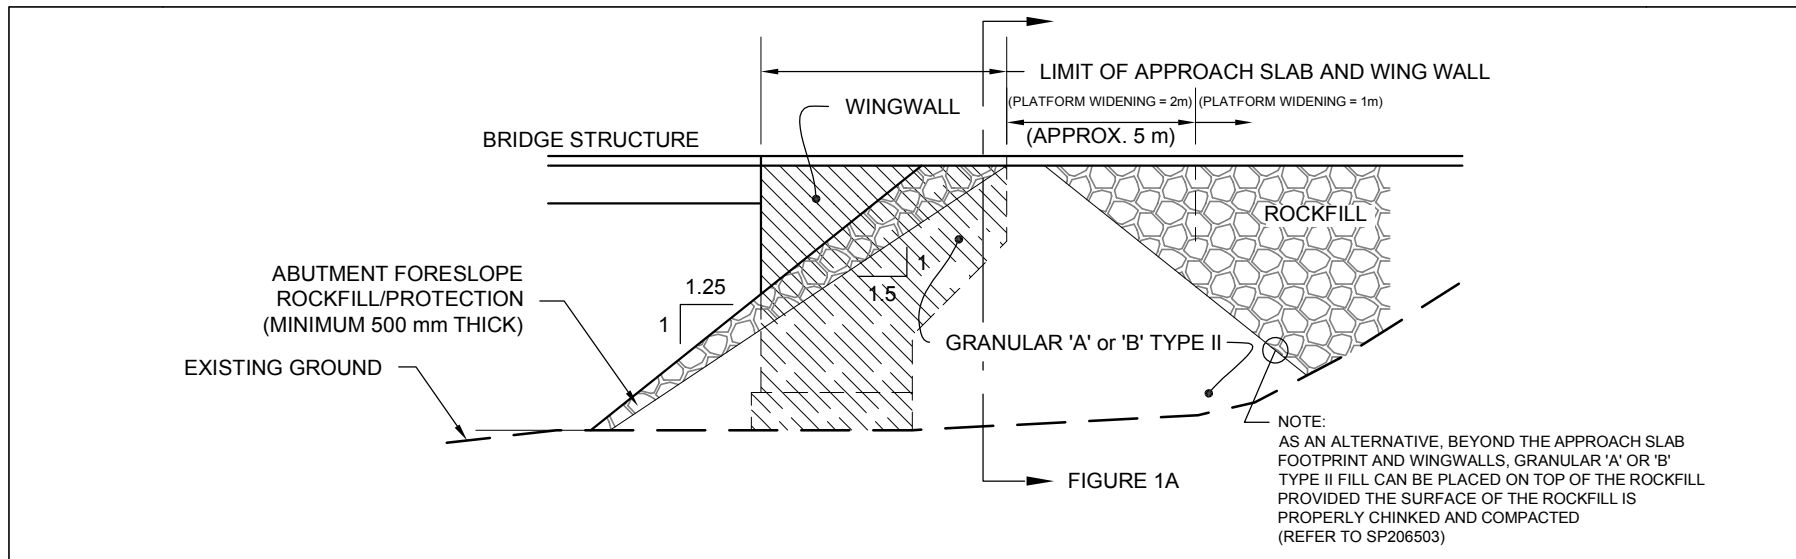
B - TYPICAL PROFILE SECTION AT EAST ABUTMENT
